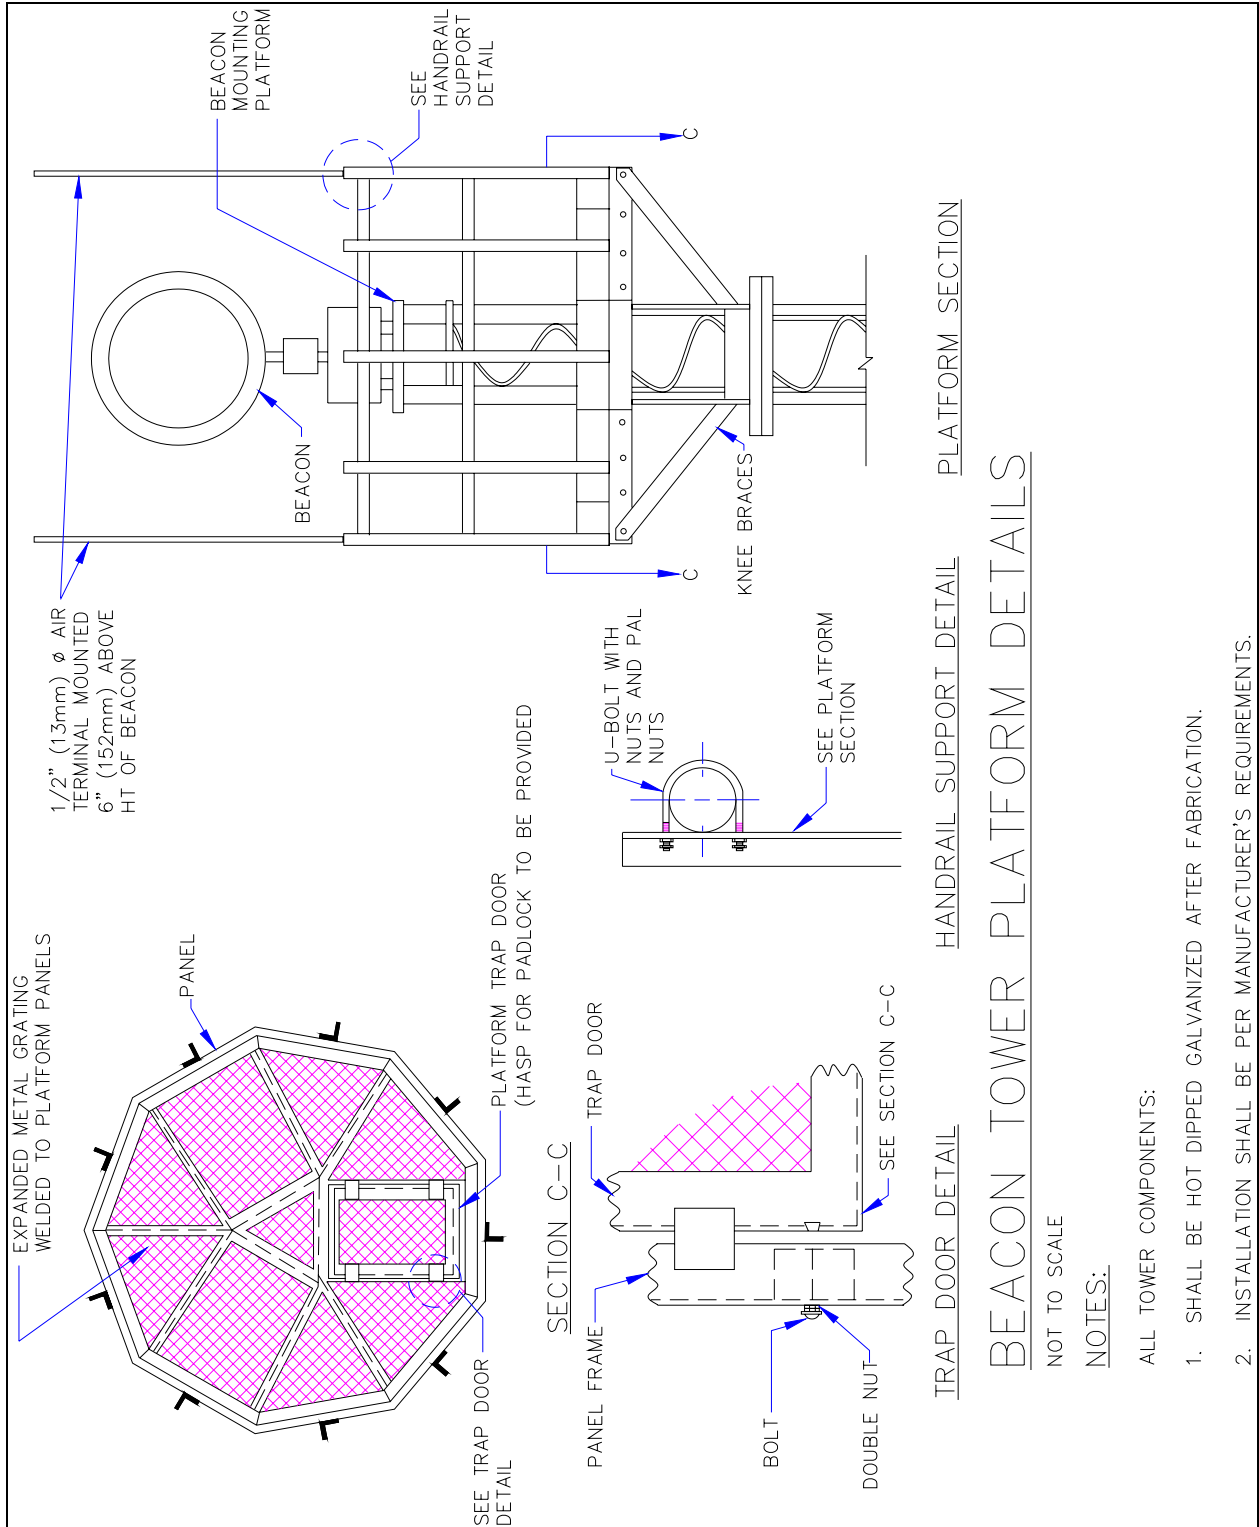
Typical Pre-fabricated Beacon Tower Structure
